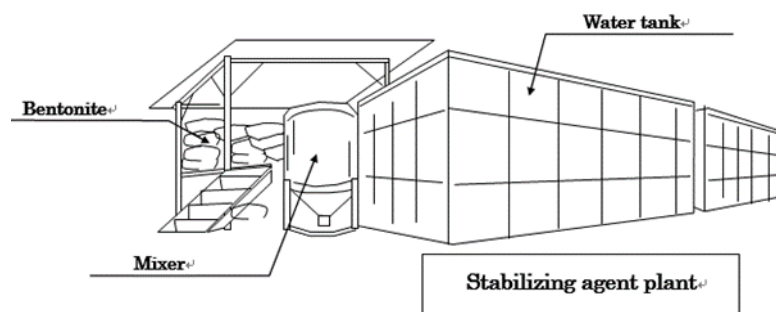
Imaging sketch of Stabilizing Agent Plant
